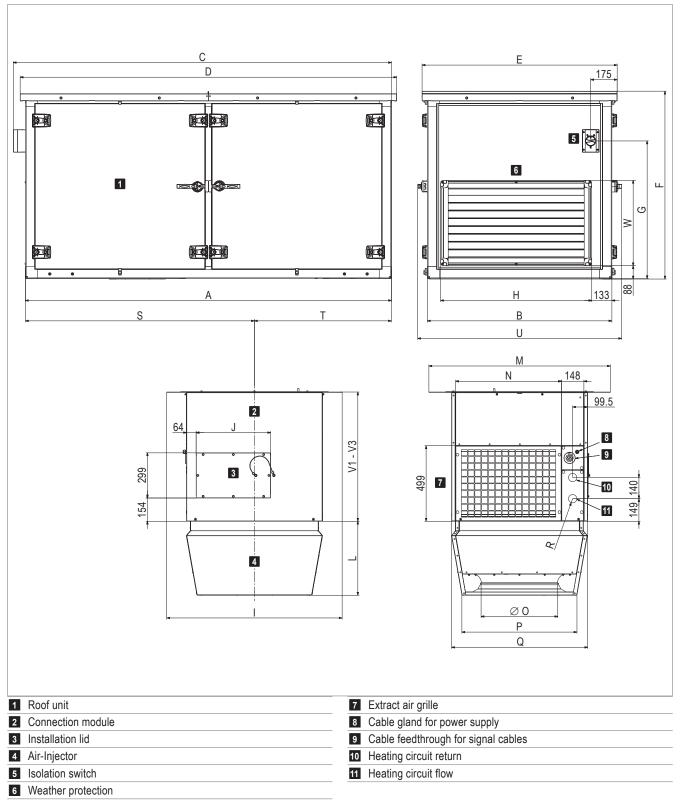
Dimensional drawing for TopVent® SH with hydraulic assembly throttling circuit (dimensions in mm)
